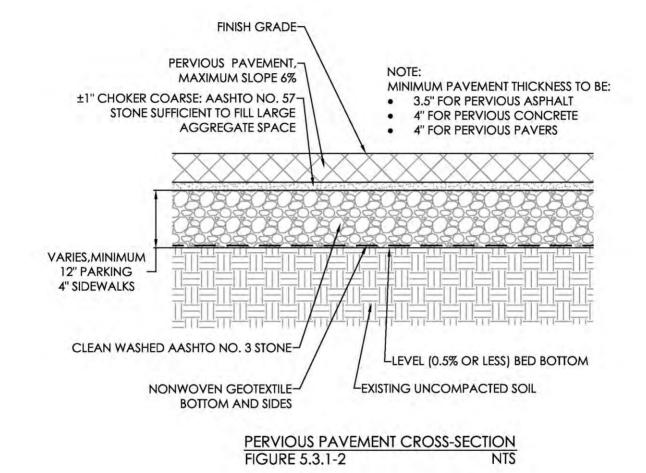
Pervious pavement cross-section. Pervious pavement beds should always be placed on level (0.5 percent slope or less) bed bottoms to prevent ponding in one area of the bed.
